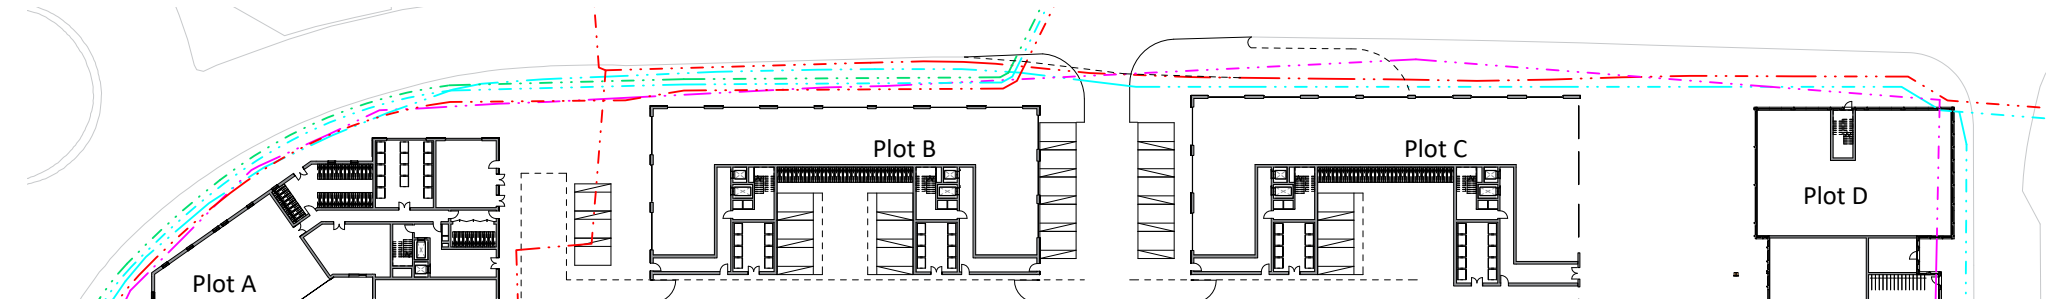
Plan of Vastern Road boundary showing the many underground services adjacent to the site
